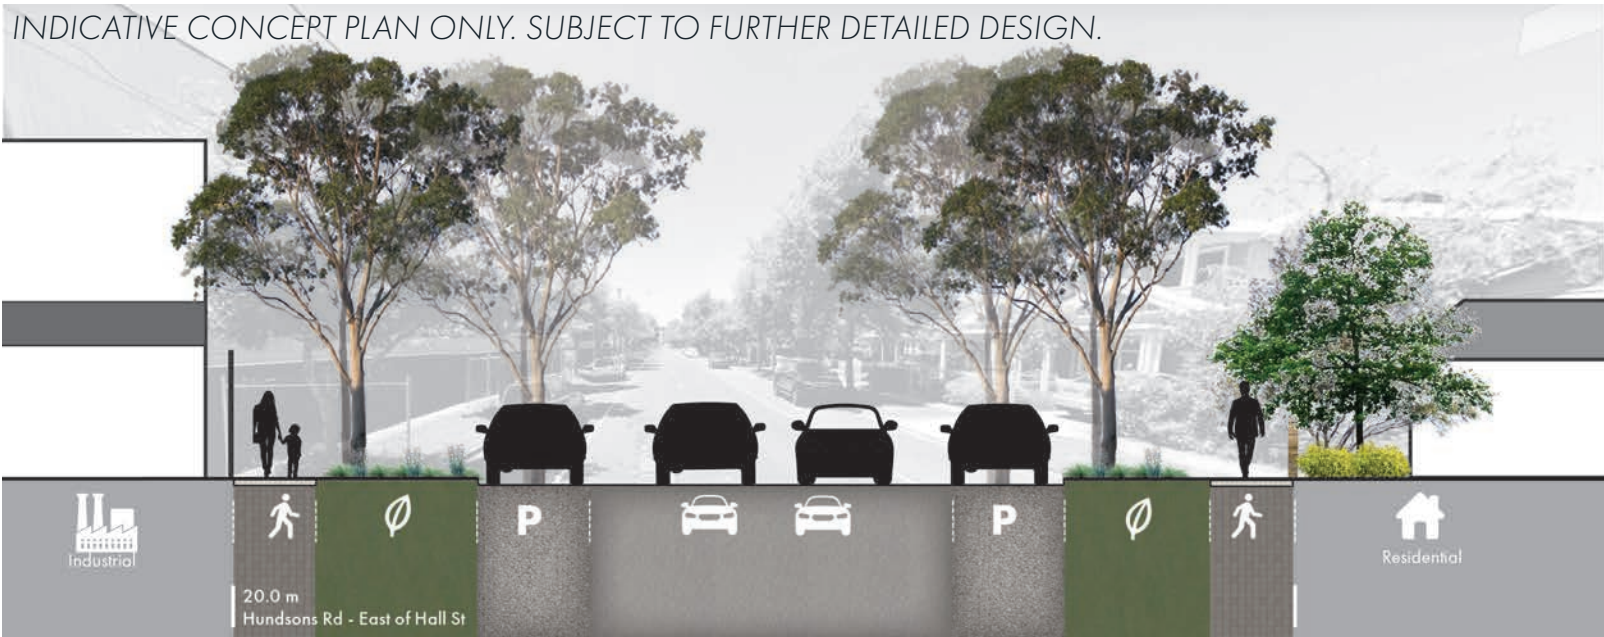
Proposed Typical Street Cross Section - Hudsons Road (between Hall Street and Booker Street)
